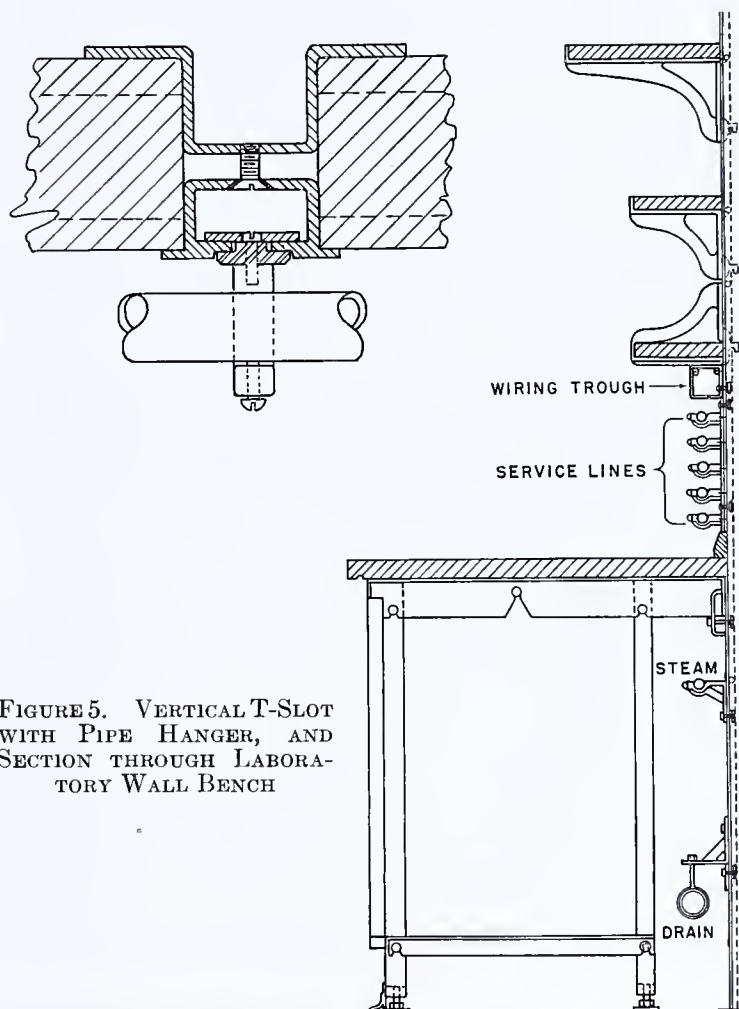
VERTICAL T-SLOT WITH PIPE HANGER, AND SECTION THROUGH LABORATORY WALL BENCH
